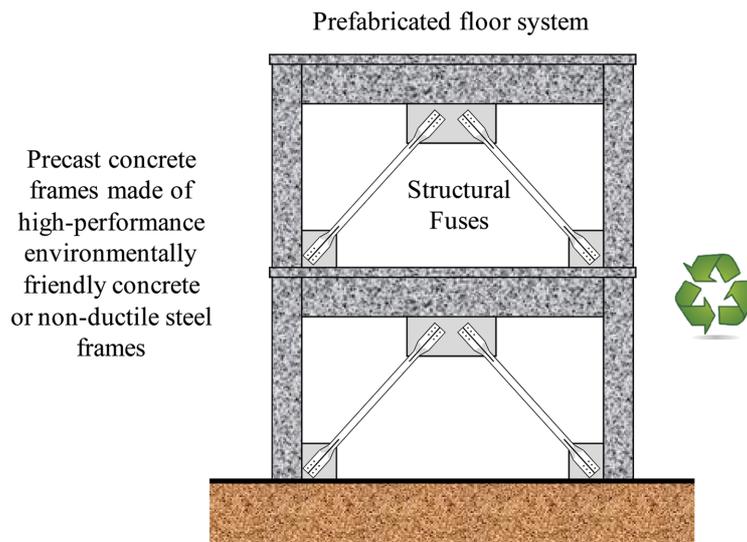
Earthquake-resistant structural system for a green reinforced concrete building
